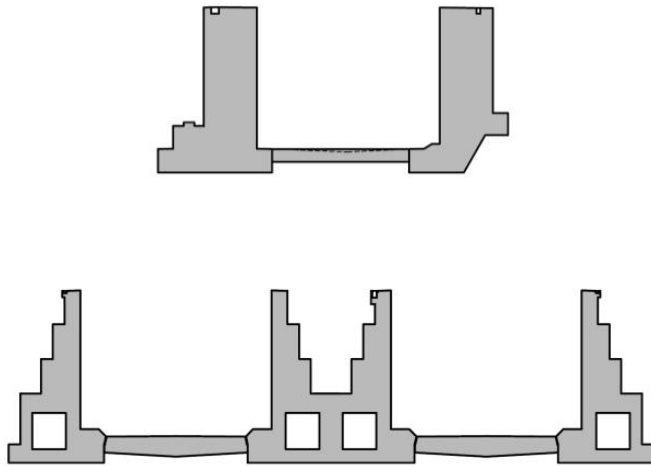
Typical navigation lock sections with gravity retaining walls.
